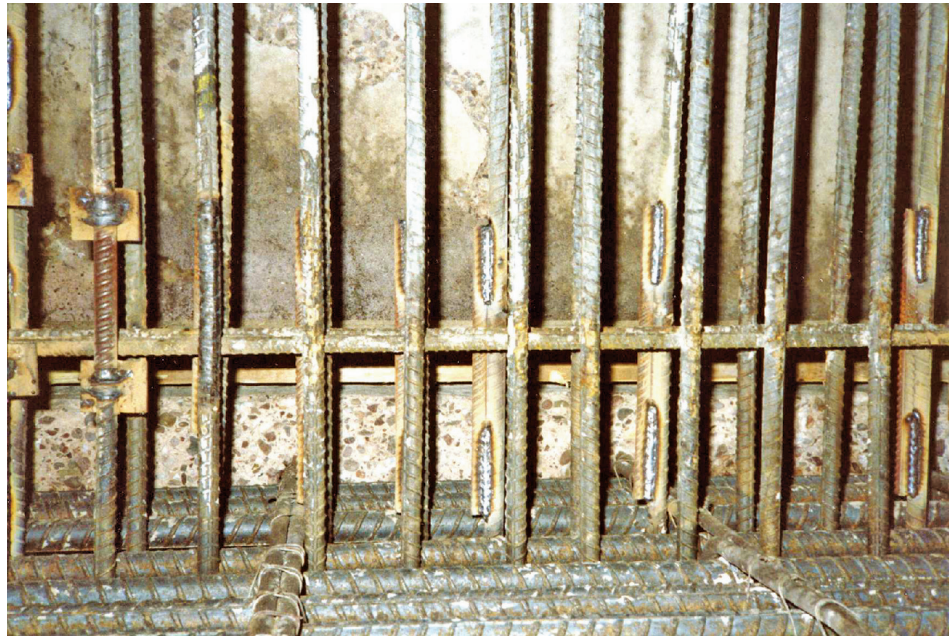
Fillet welding, weld filling, and butt welding of panel wall reinforcement
